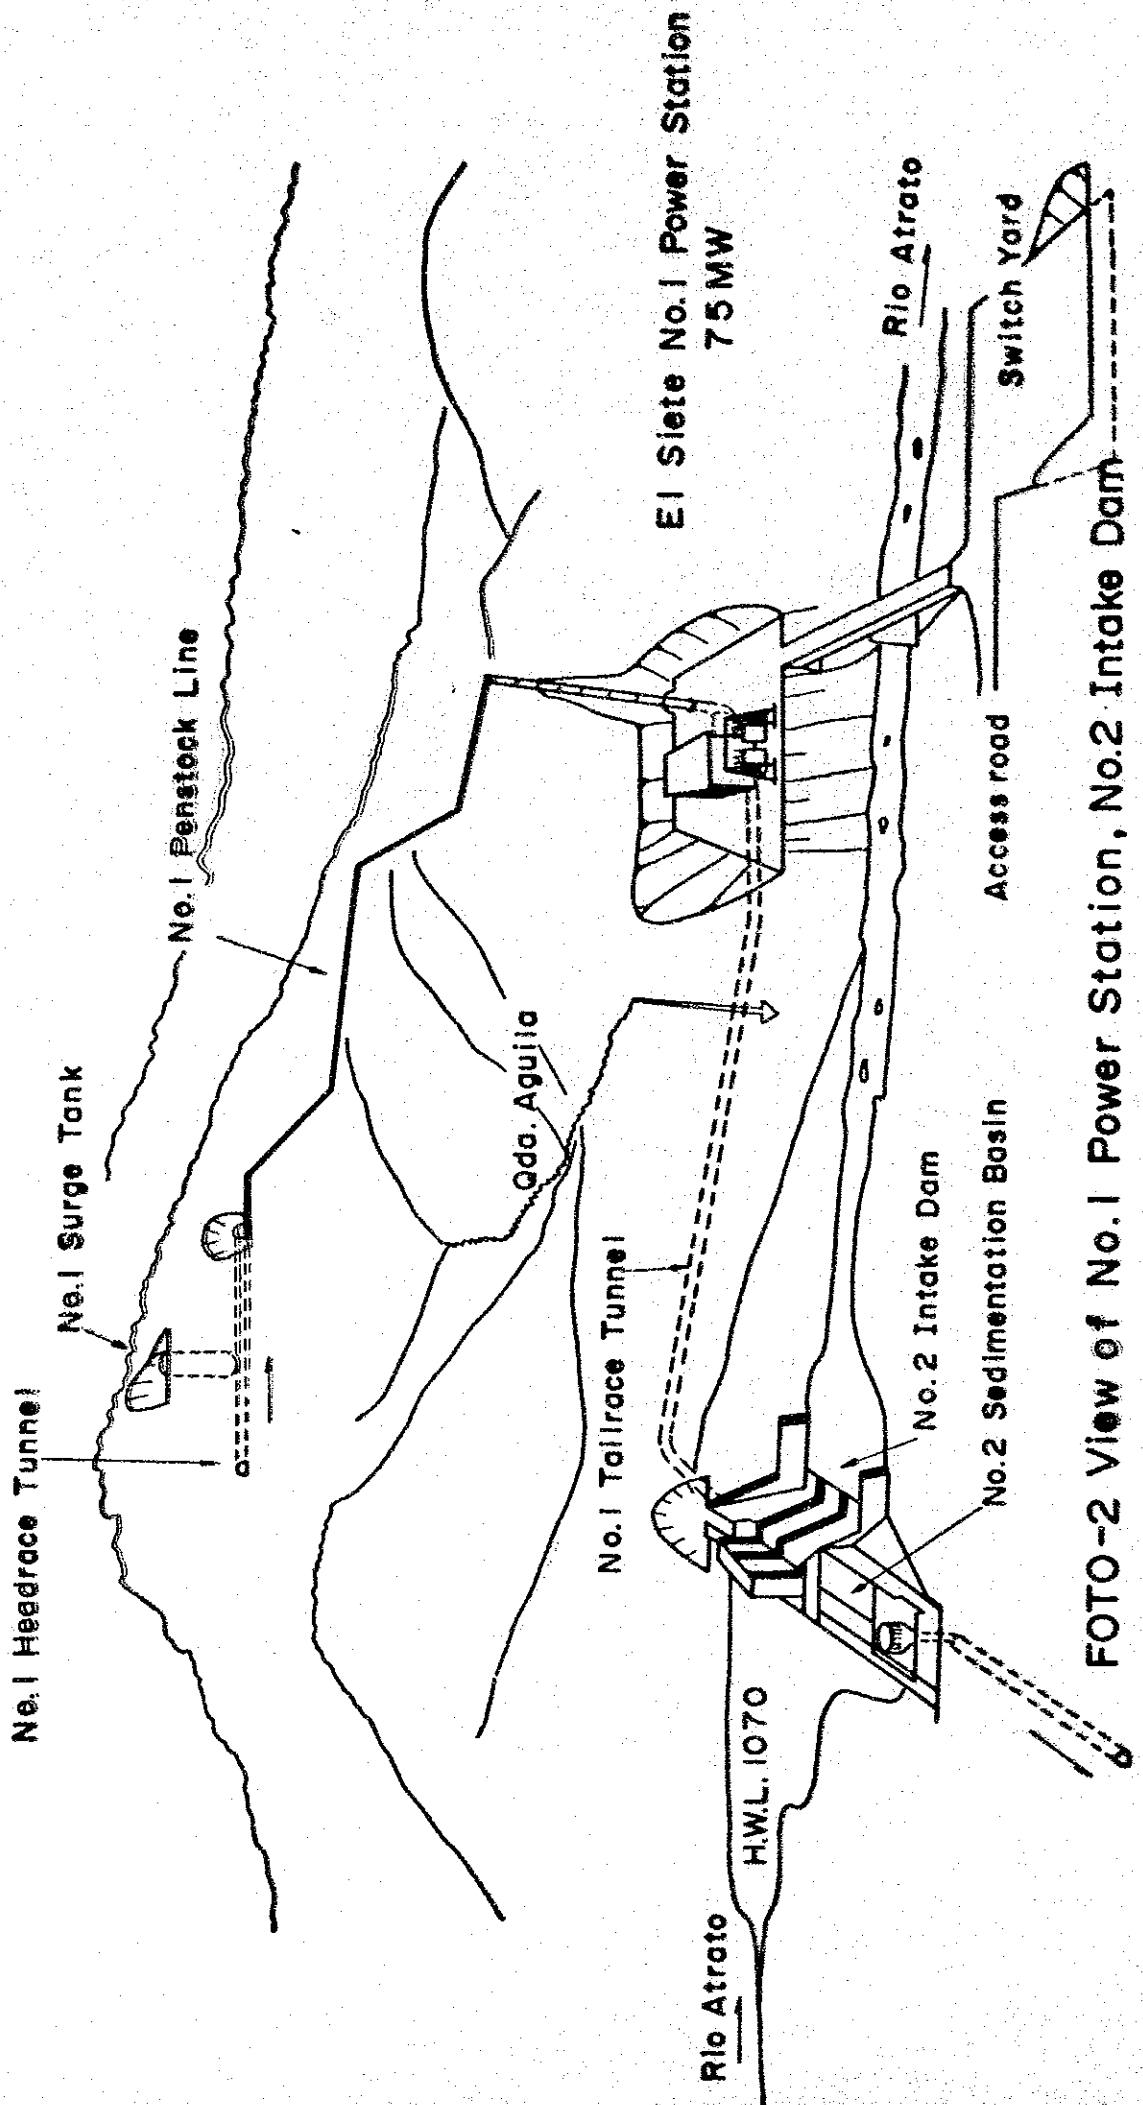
View of No. 1 Power Station, No. 2 Intake Dam
